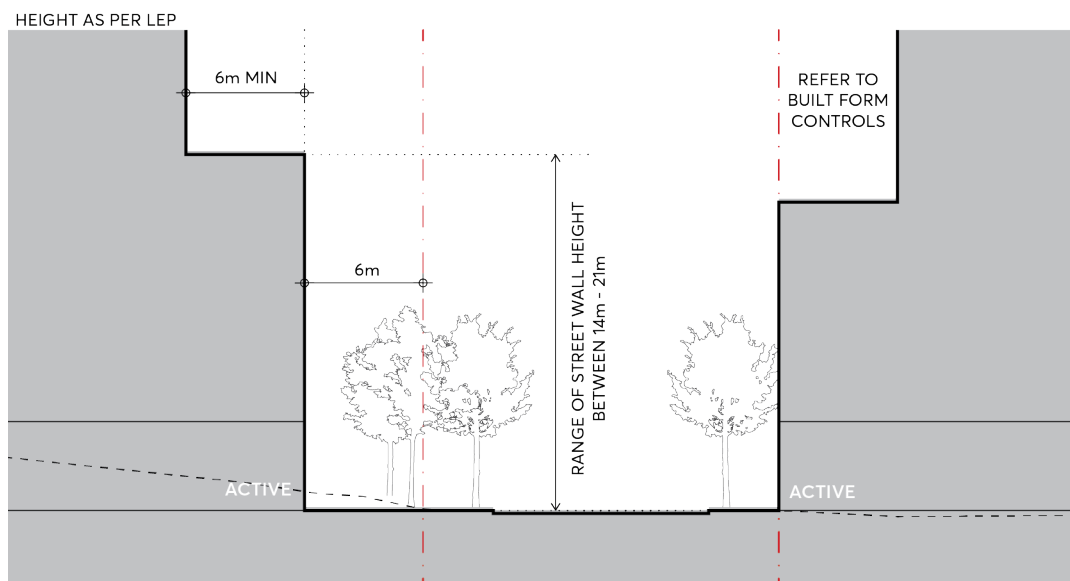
Campbell Street (Section B) Setbacks and Street Wall Height
